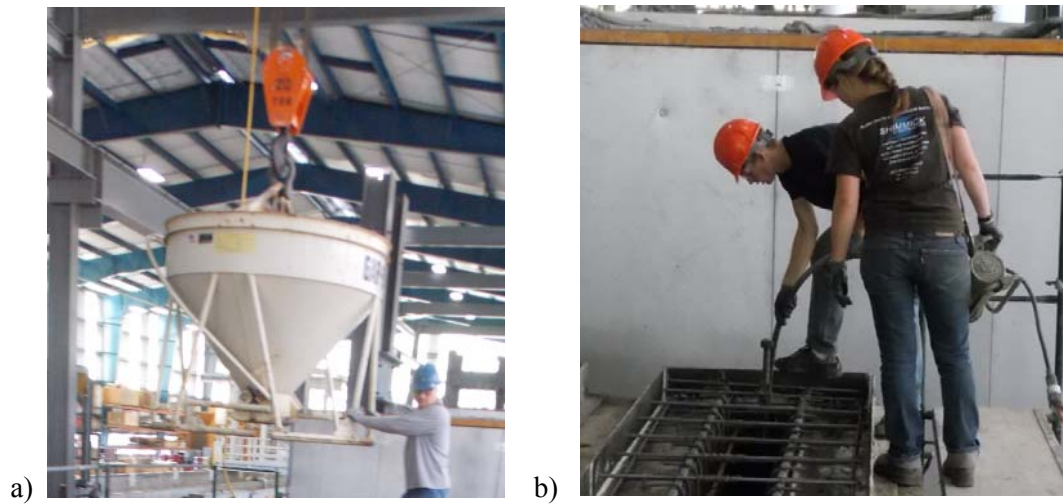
a) Clamshell bucket carrying concrete and b) Consolidating concrete
